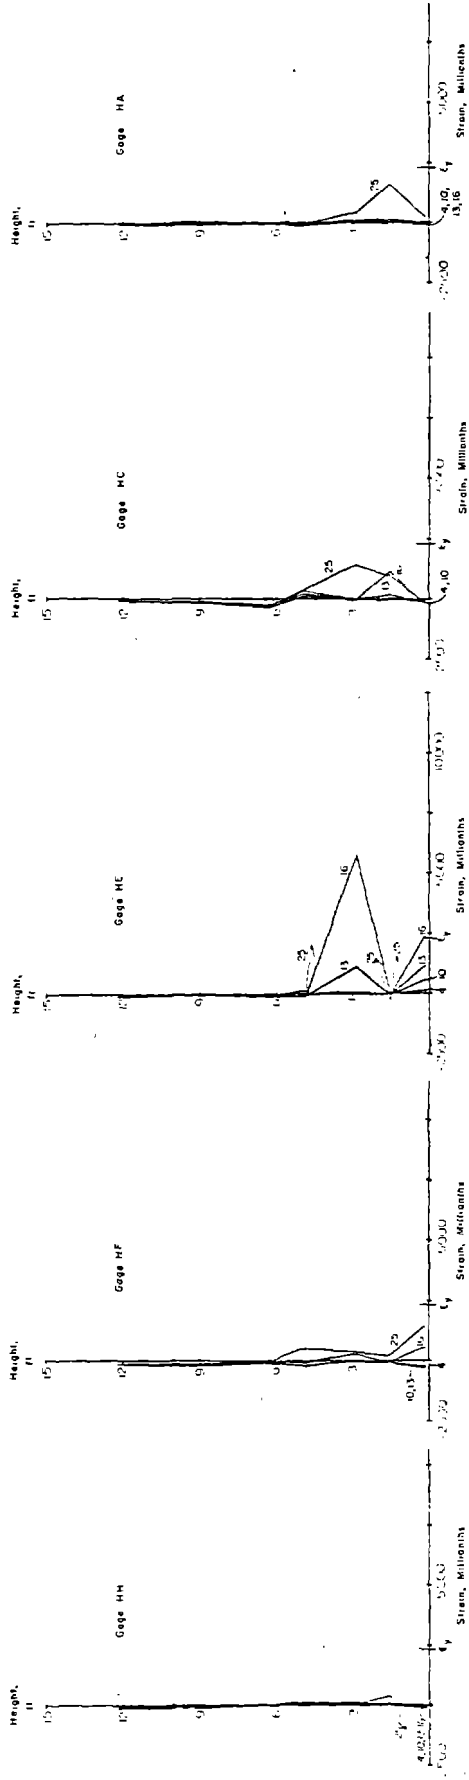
Horizontal Reinforcement Strains at Maximum Positive Loads for Specimen R1
